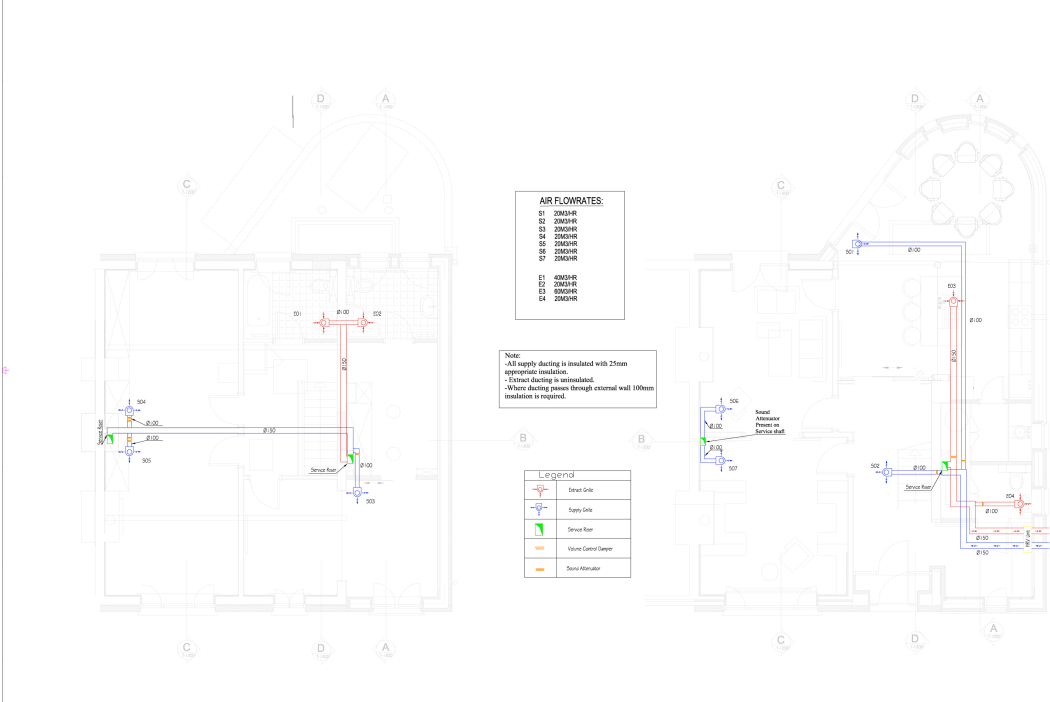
layout of ductwork and MVHR unit location, supply rooms in blue, extract rooms in red
